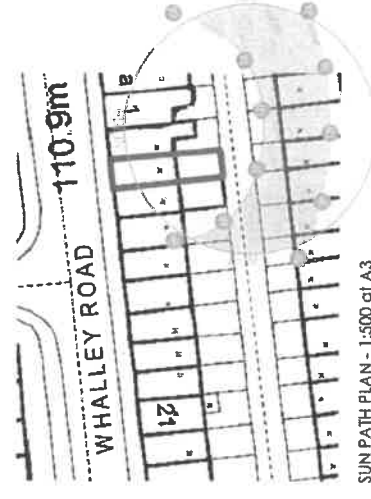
sun path diagram shows south facing rear façade where minimal overshadowing would occur to neighbouring property
